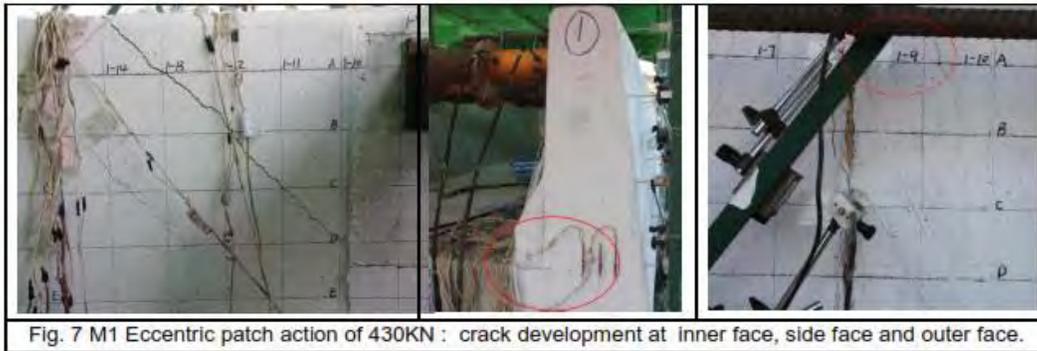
M1 Eccentric patch action of 430KN : crack development at inner face, side face and outer face.
